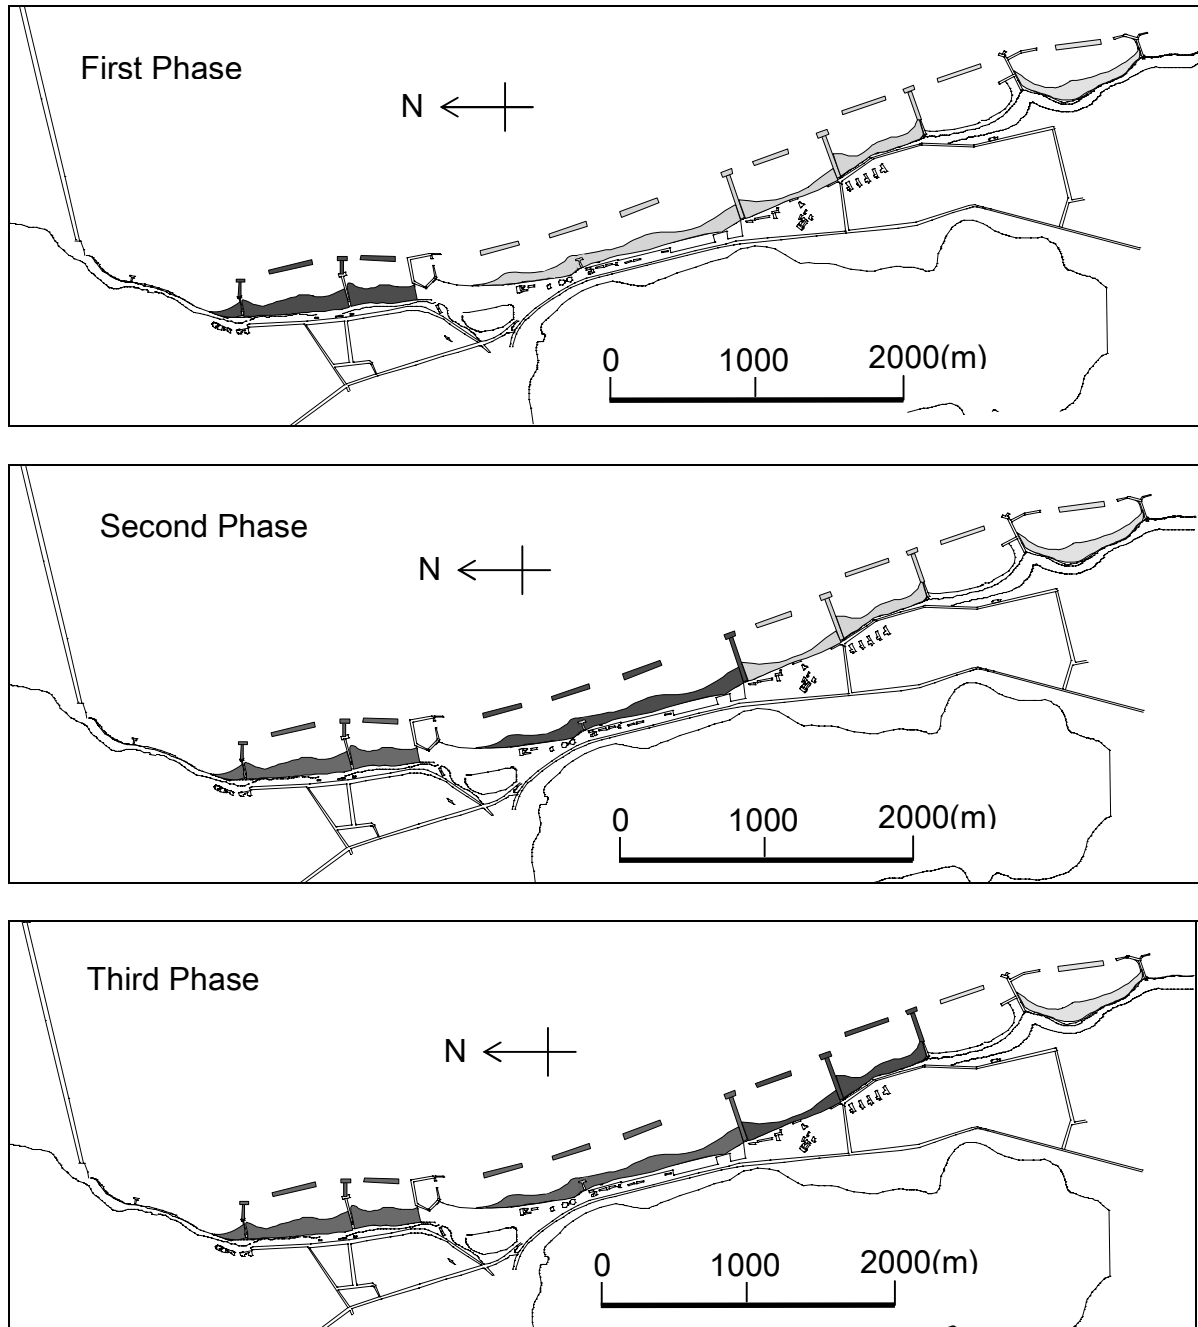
Modified phase-wise plans for facility installation in Eforie Sector
